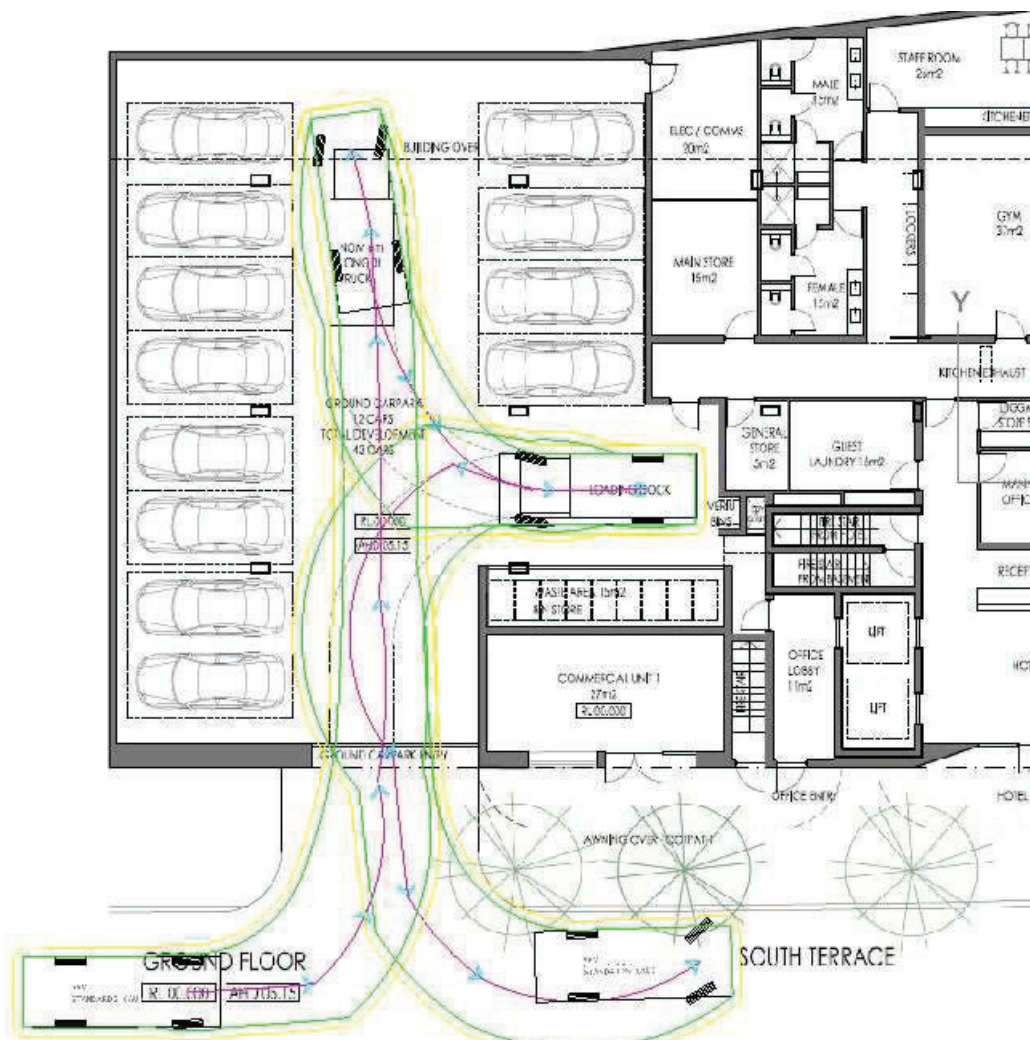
Ground floor loading dock and swept path of 6.4m truck
